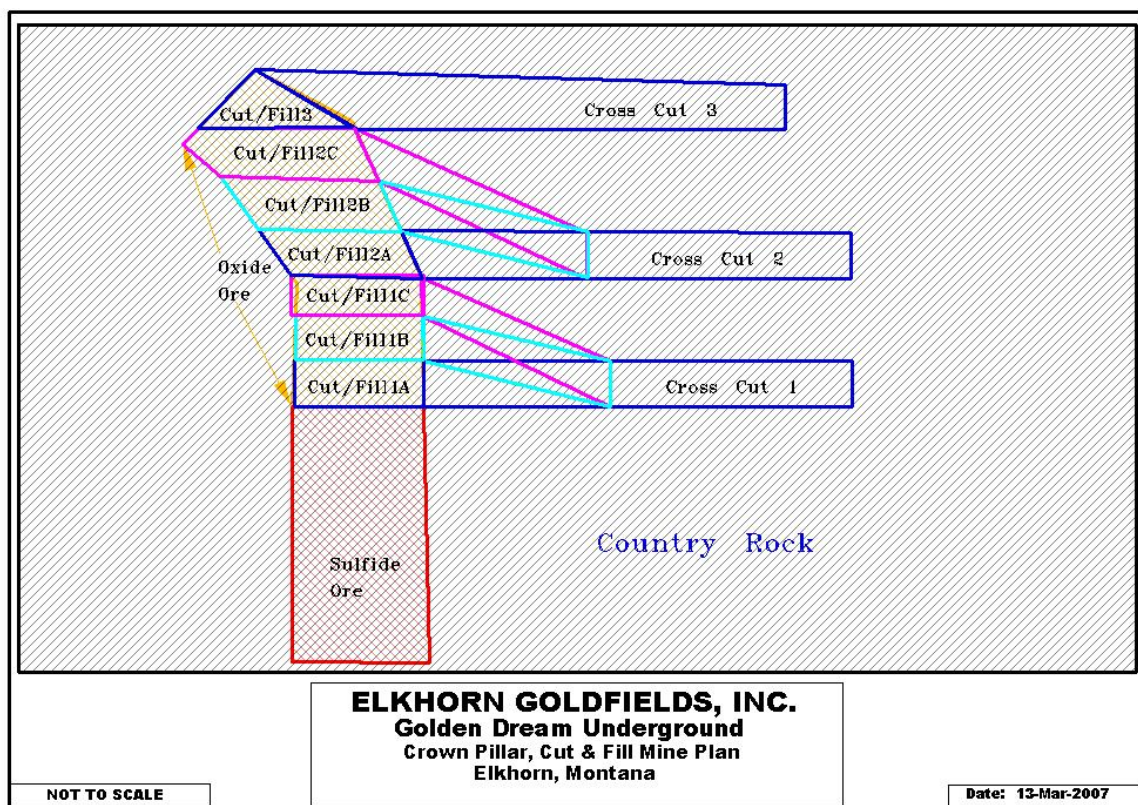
Schematic Cross-Section Illustrating Cut-and-Fill Mining Method.
